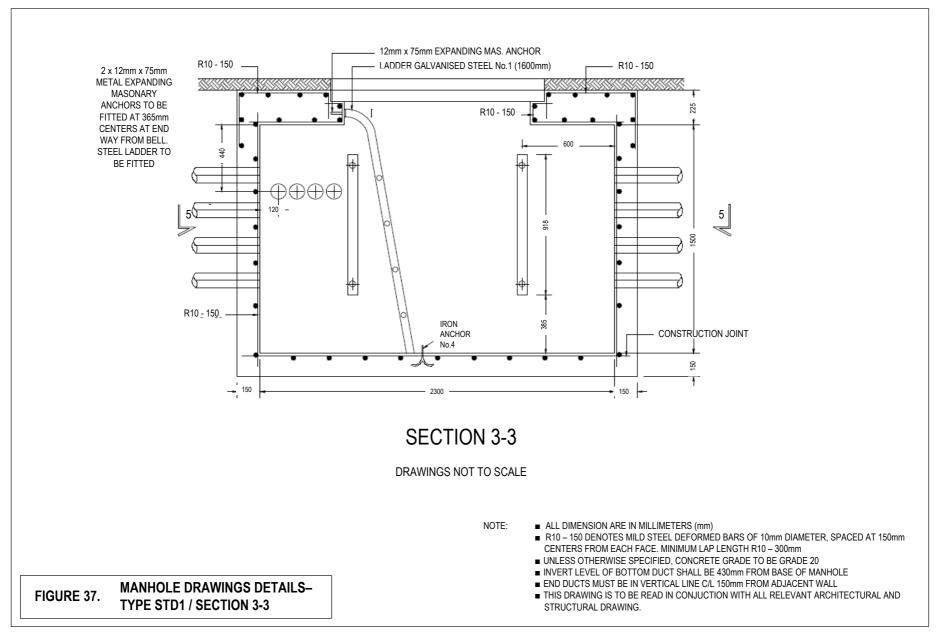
Manhole drawings details - Type STD1 / section 3-3
